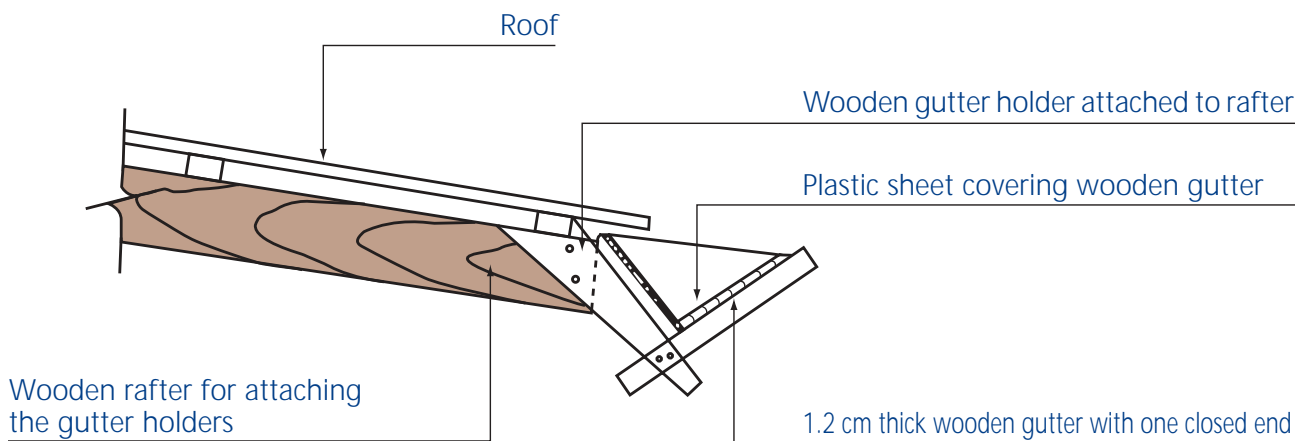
Fix the "V" shape wooden gutter to wooden roof structure.
